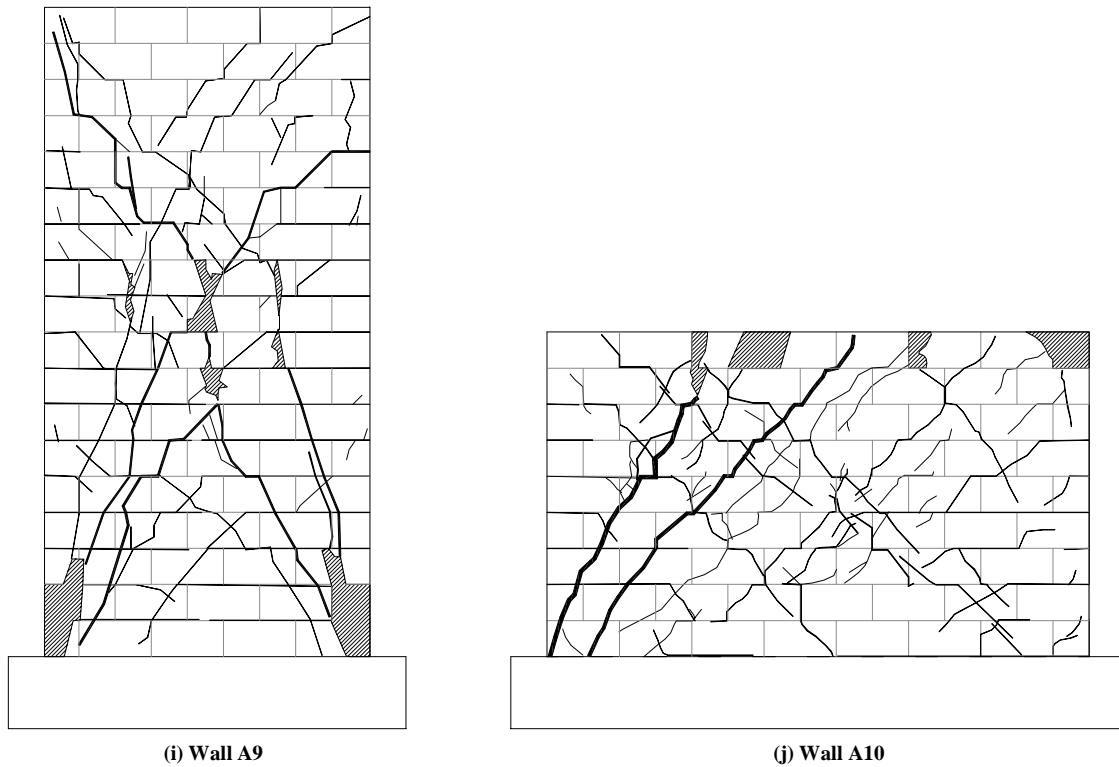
Series A, masonry wall cracking patterns (continued).
